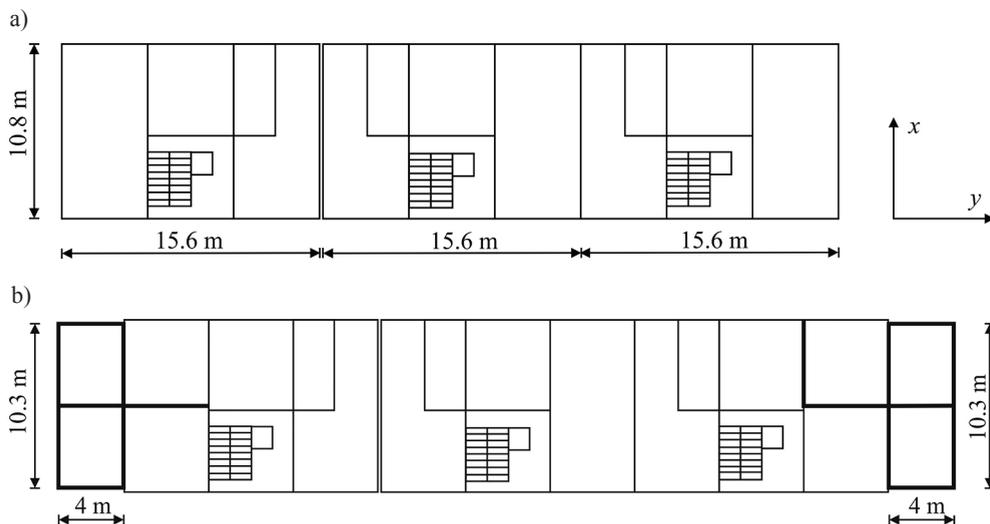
Floor plans of analysed structures: a) building “A0”; b) building “A1” with reinforcement as lines marked in bold [6]
